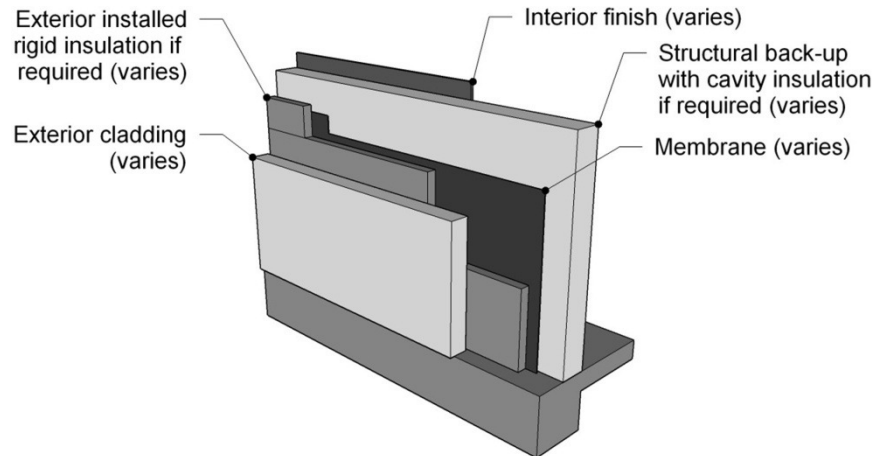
Typical Assembly Layers for Exterior Infill Wall Enclosures
